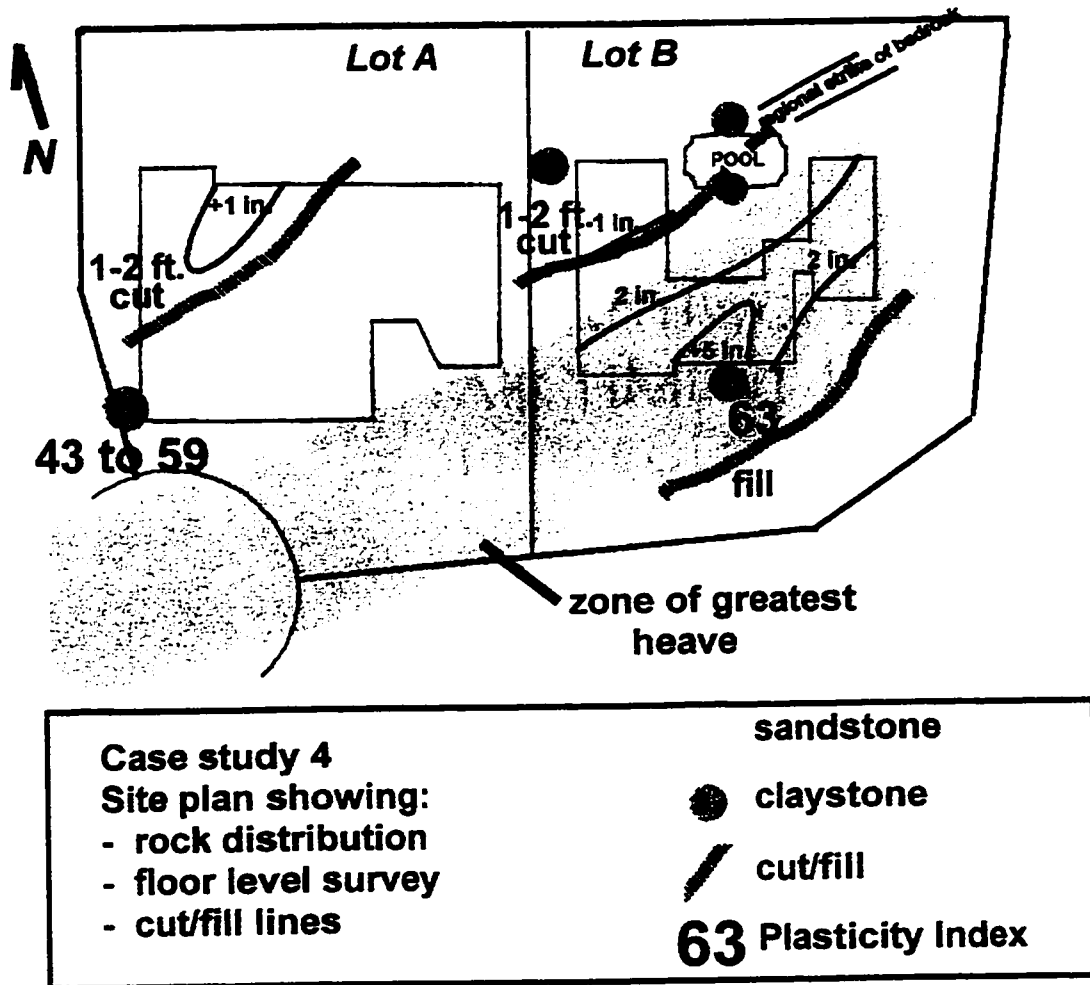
Site plan case study 4. Water ponded beneath the floor in the area of the +5 in. floor level contour on lot B, causing the claystone to swell. On lot A, the greatest heave occurred in an area of cut.
